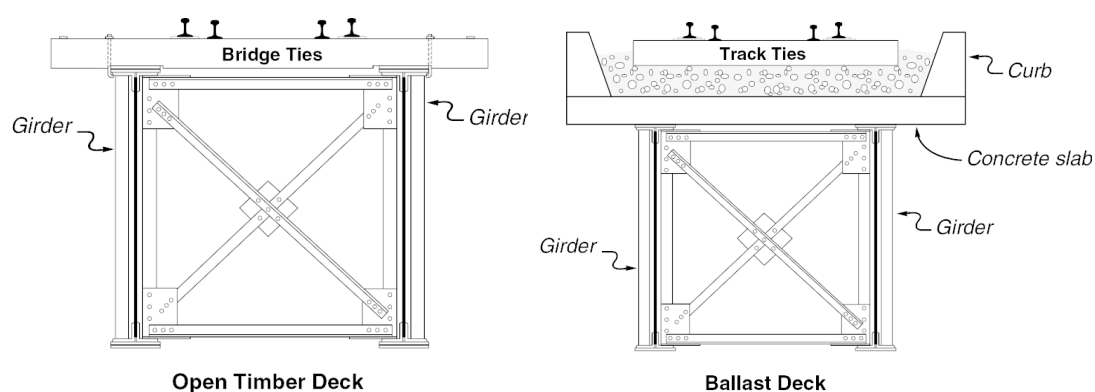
Open Deck Structure and Ballast Decked Bridge [17]
